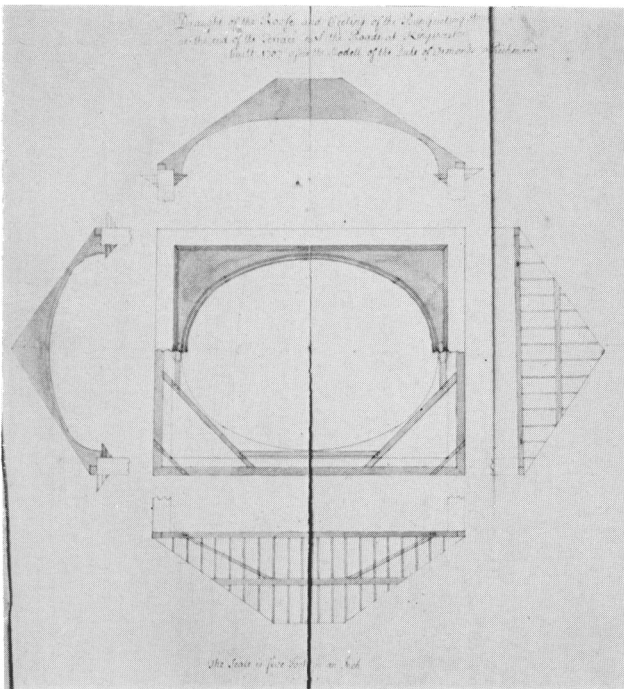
Roof and ceiling of the banqueting house, Kings Weston [42]
